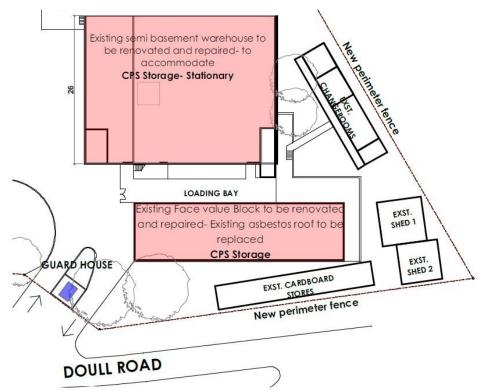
Existing facility Proposed Lower Ground Floor space Allocation
